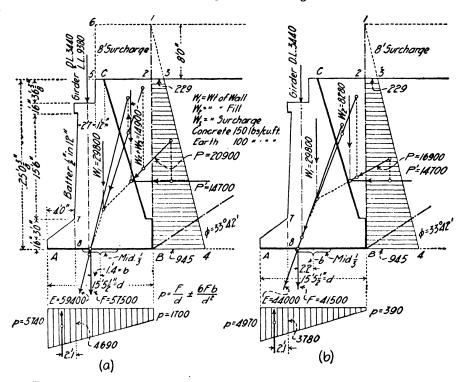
ABUTMENT FOR WEST ALAMEDA AVENUE SUBWAY, DENVER, COLO.
